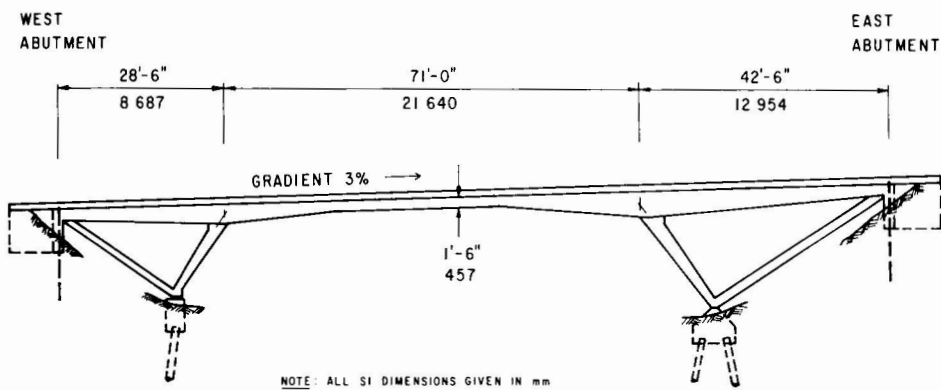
South elevation, former Ottawa River Parkway Service Road Bridge. (Width of bridge = 103'-0" (31 394 mm) skewed at 10° 50')
